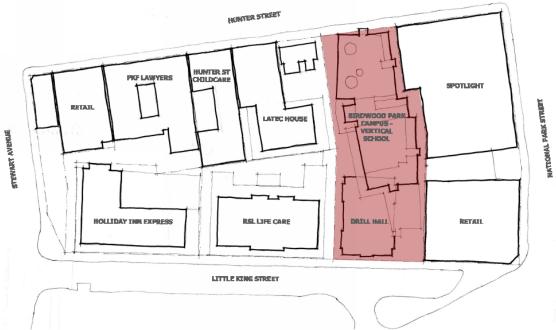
Preliminary Site Plan (Source: EJE Architects)
